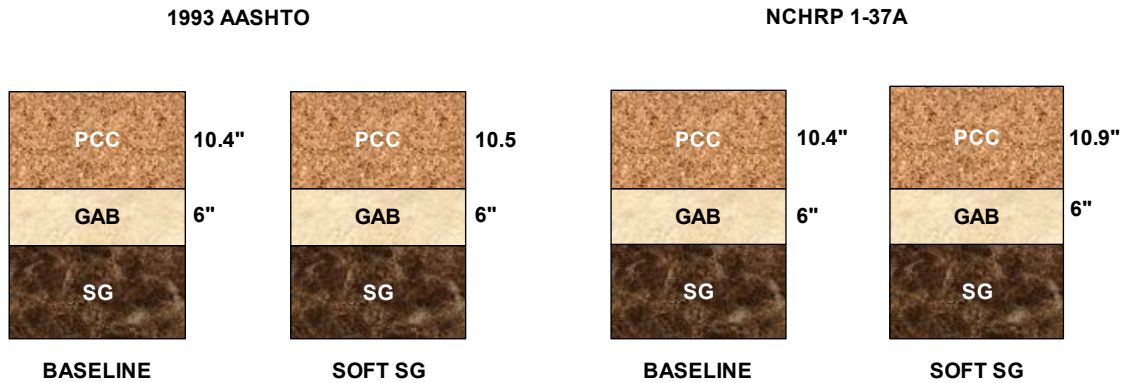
Summary of rigid pavement sections: soft subgrade scenario.
